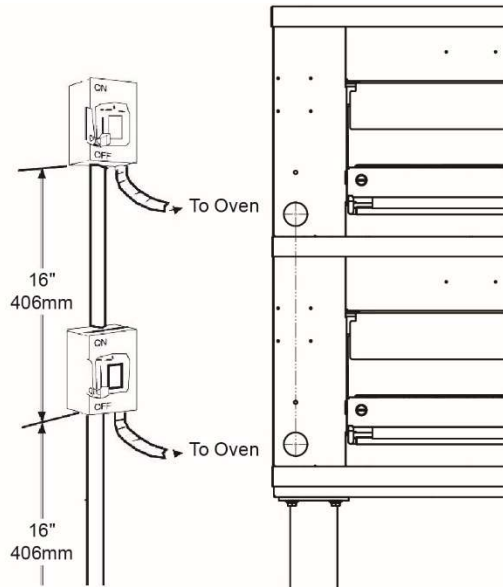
Typical LW26/LW33 Stacked Oven Installation
